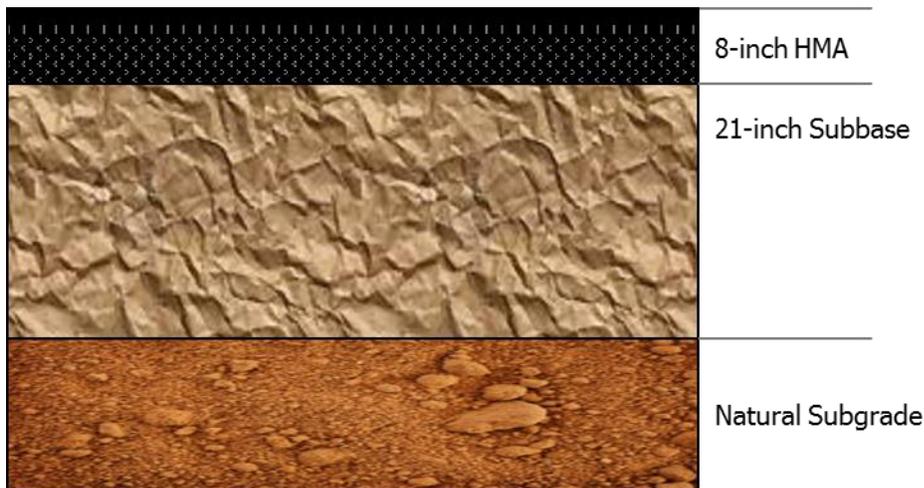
Existing Flexible Pavement Design Structure.⁴²
